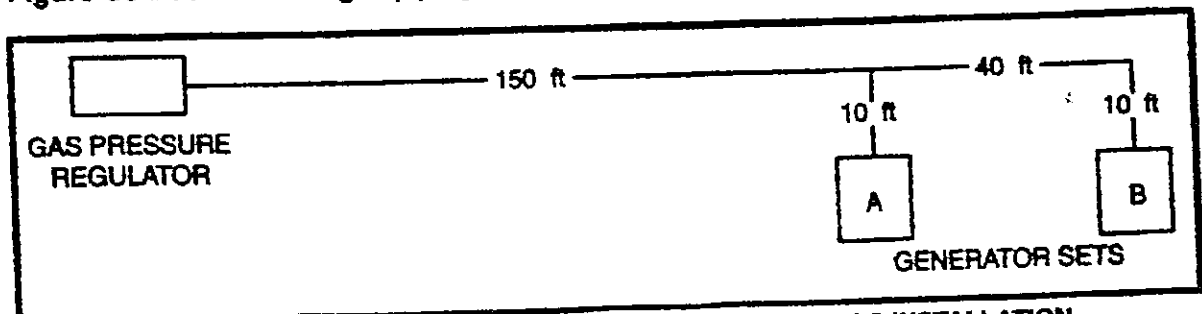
GAS PIPING LAYOUT FOR A TWO-GENERATOR INSTALLATION
